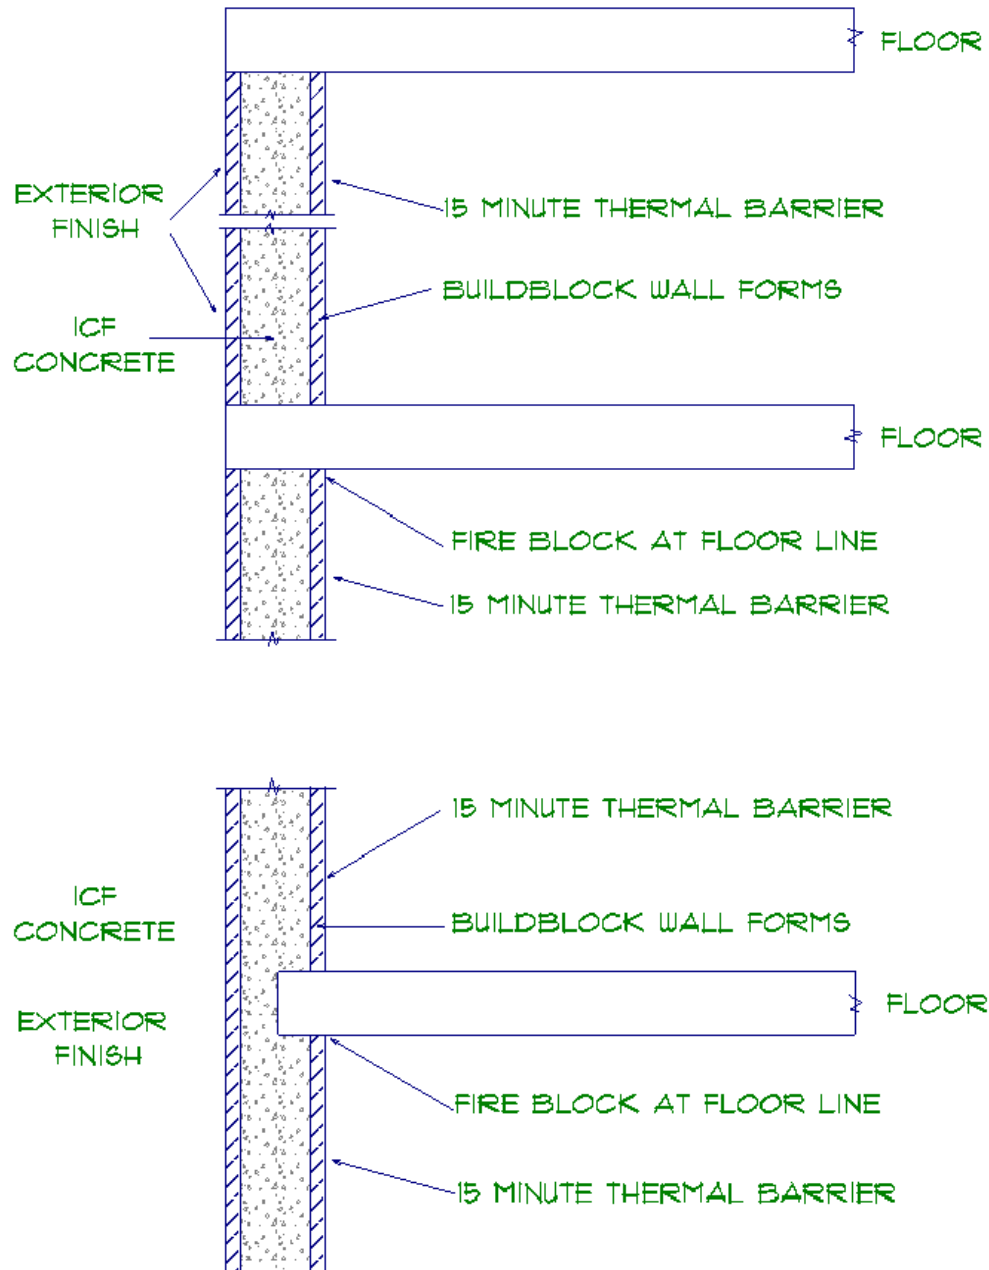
BUILDBLOCK® TYPICAL WALL DETAIL FOR NON COMBUSTIBLE CONSTRUCTION
